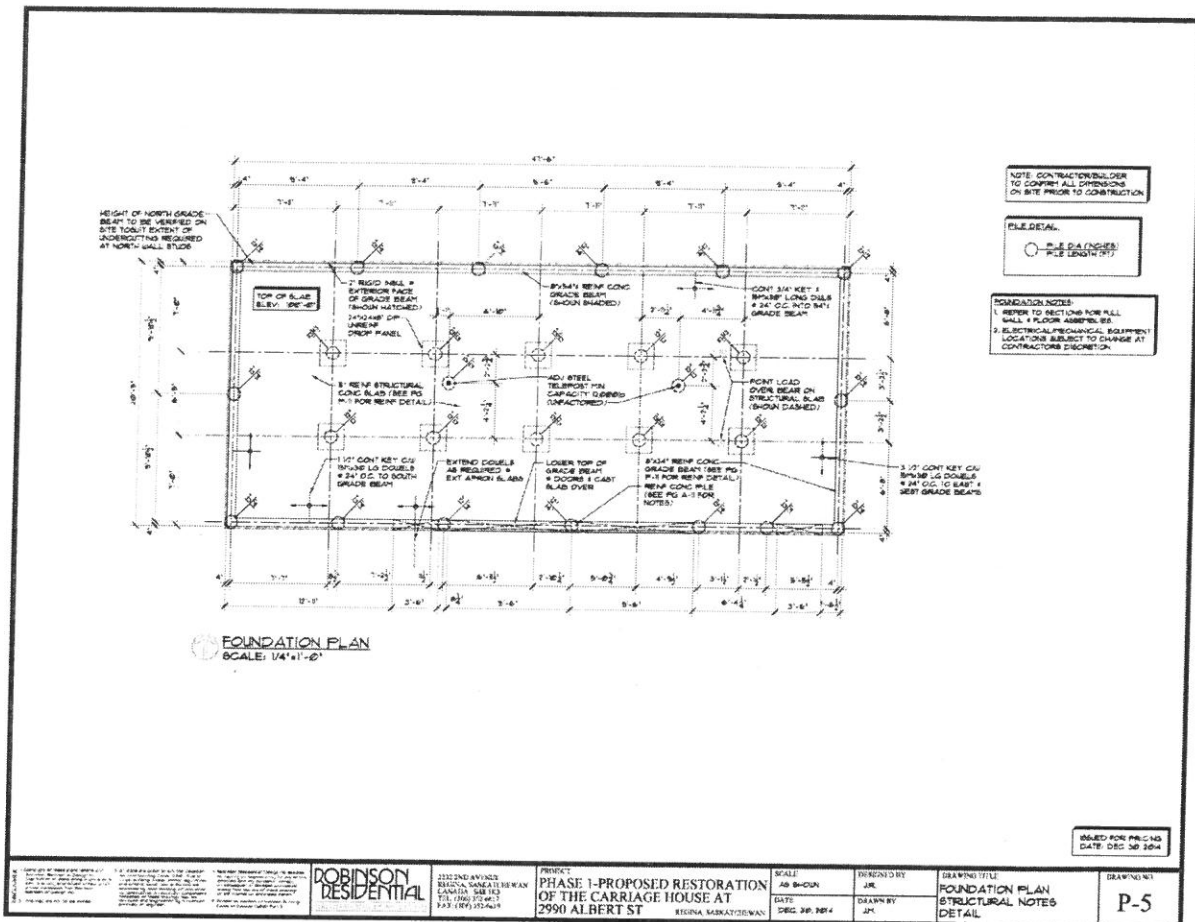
The foundation plan of the carriage house for the proposed rehabilitation.
